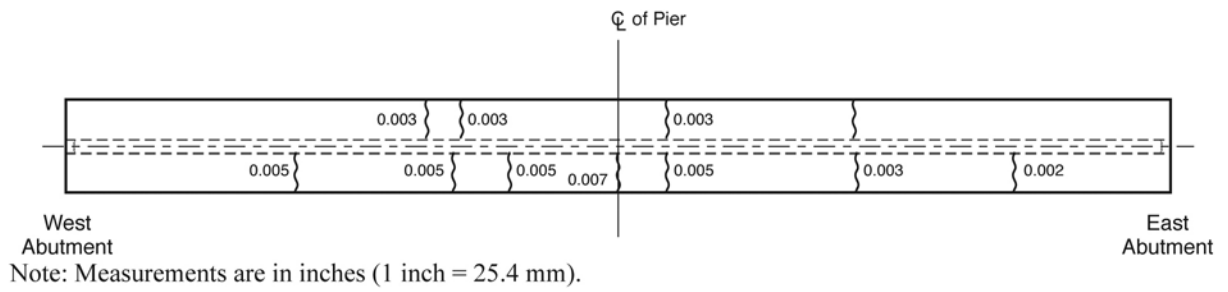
Cracking of the deck slab over the steel beam.
